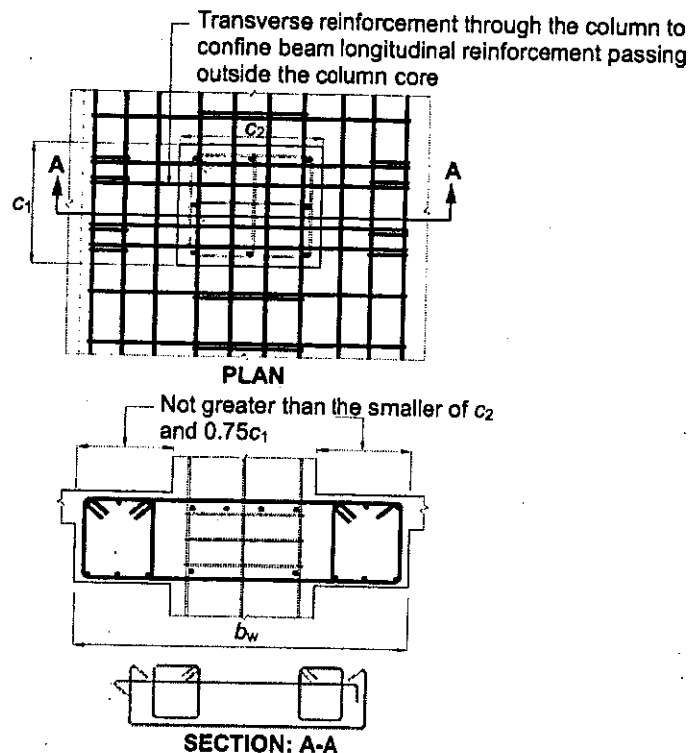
(B) MAXIMUM EFFECTIVE WIDTH OF WIDE BEAM
